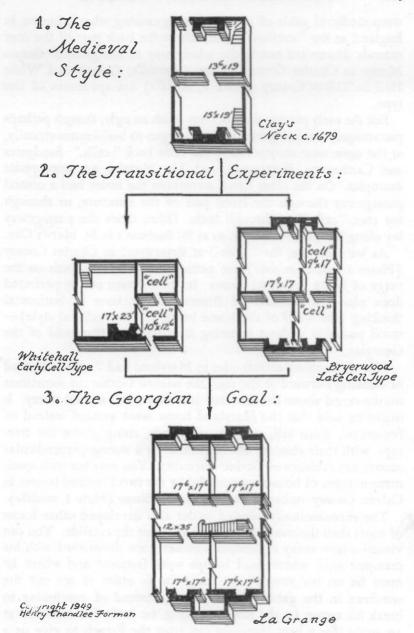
Diagram showing steps in the development of the interior plan (isometric block plans) in the colonial domestic architecture of Maryland.
